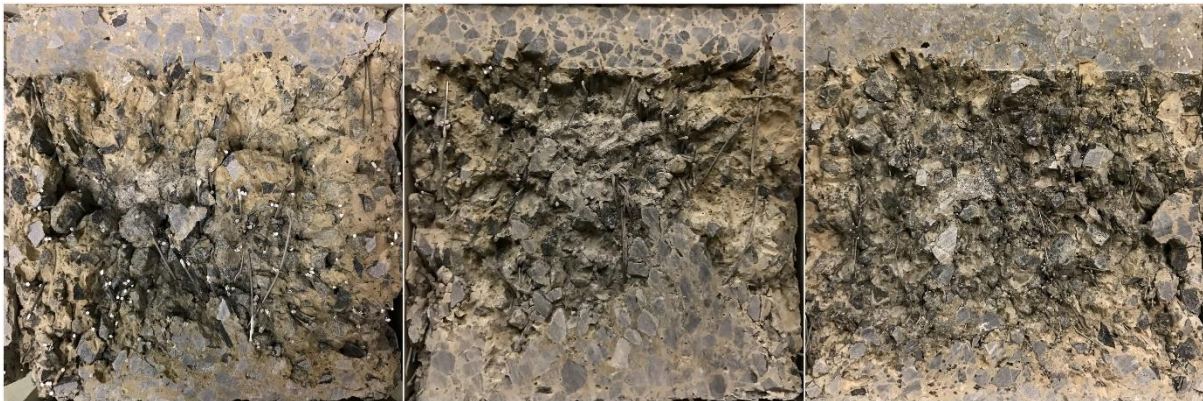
Examples illustrating the condition of the fracture surface
